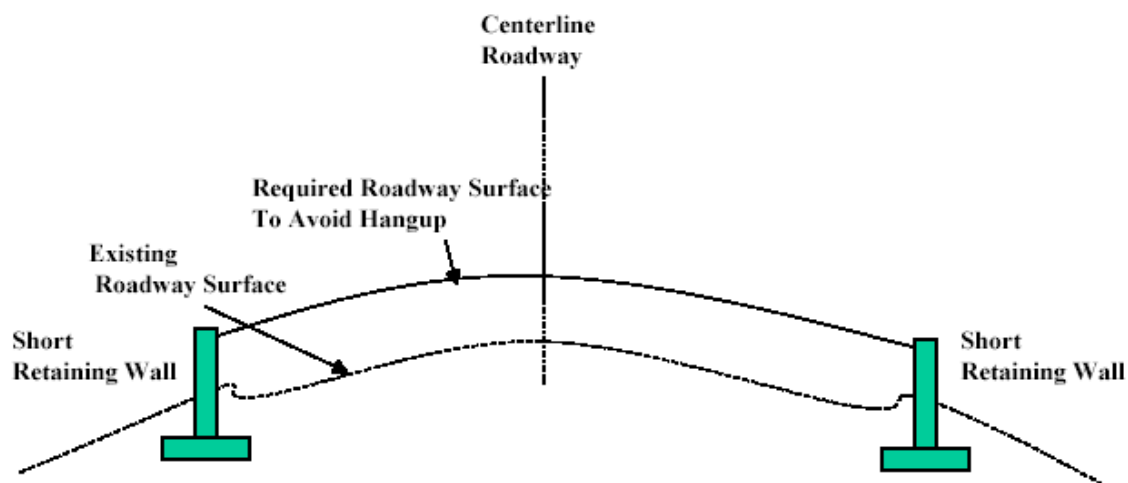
Raising Roadway Surface: Roadway Cross-Section Near a Grade Crossing
